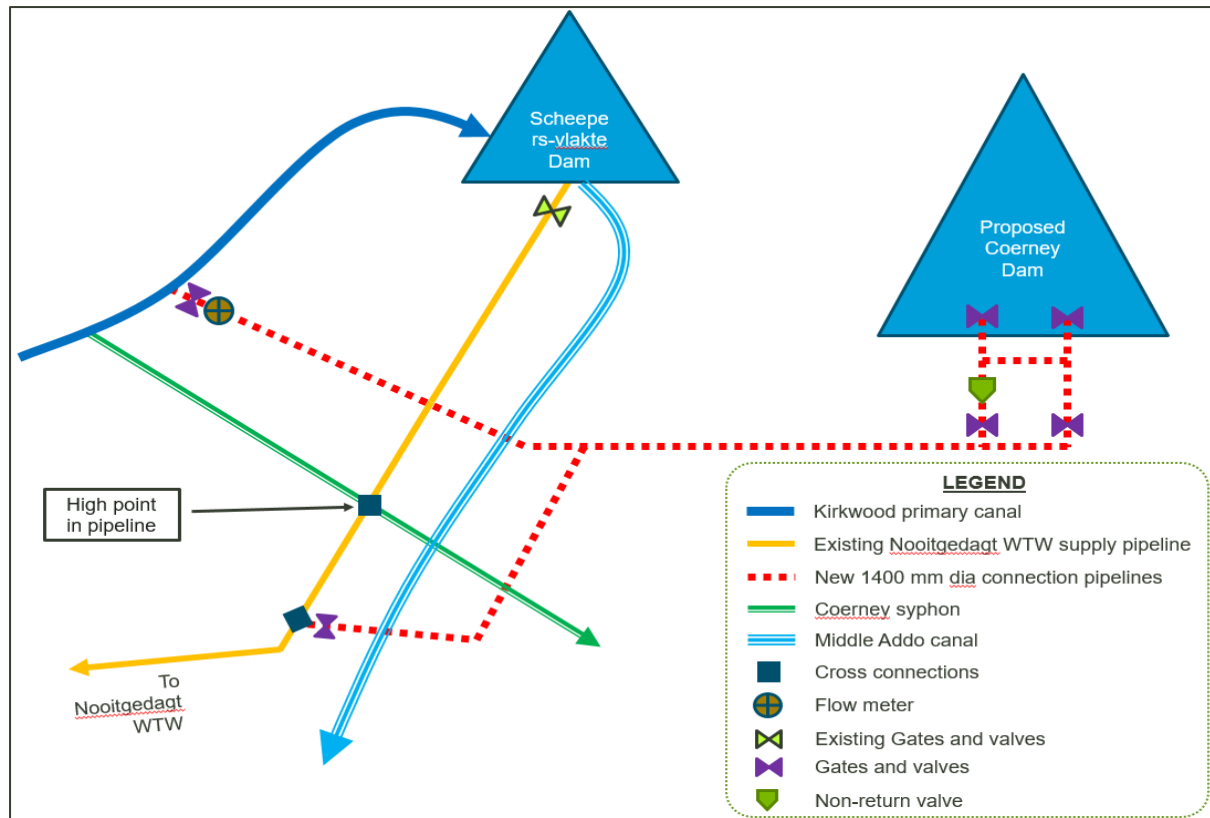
Schematic layout of the proposed new dam and connecting pipelines (DWS, 2020)
